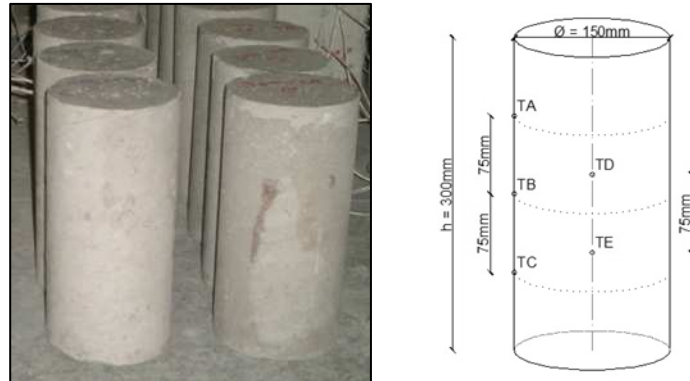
Specimens for the tensile splitting tests and location of thermocouples
